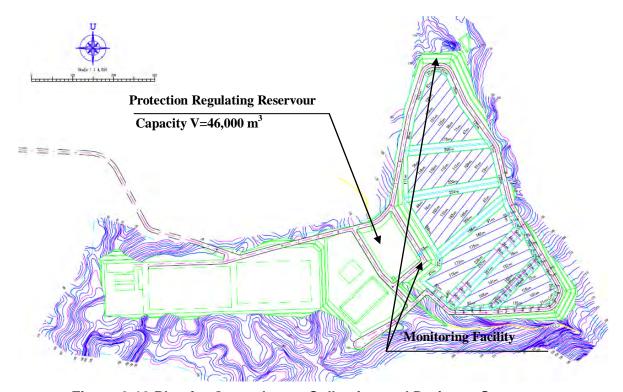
Plan for Groundwater Collecting and Drainage System
